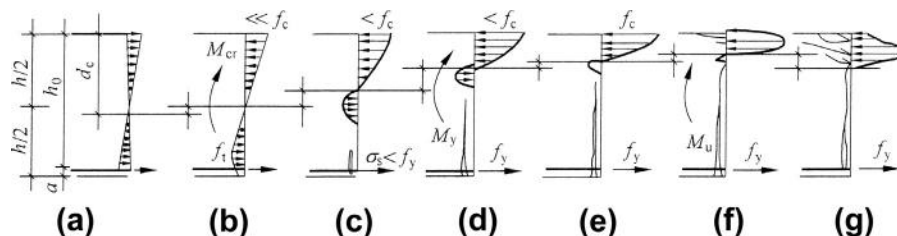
Developments of sectional stress and crack of beam: (a) before cracking, (b) just cracking, (c) after cracking, (d) yielding of reinforcement, (e) after yield, (f) ultimate state, (g) descending branch
